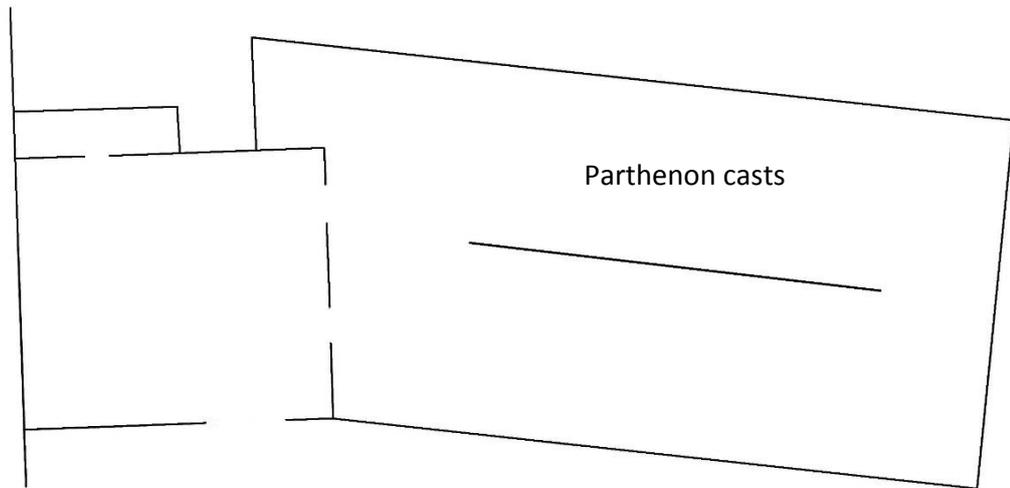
Floor plan of the Skulpturhalle. Image author's own
